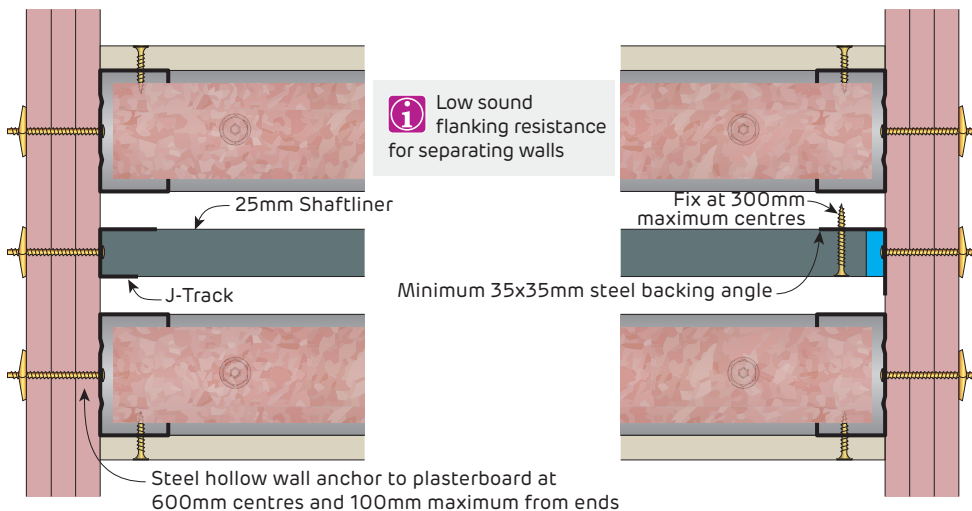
InterHome High-Rise Wall to Shaft Wall Plan
